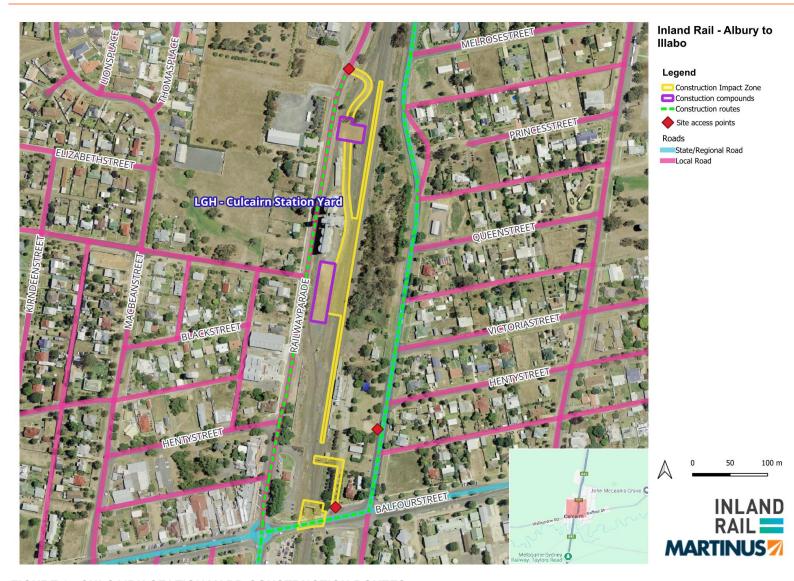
CULCAIRN STATION YARD CONSTRUCTION ROUTES
